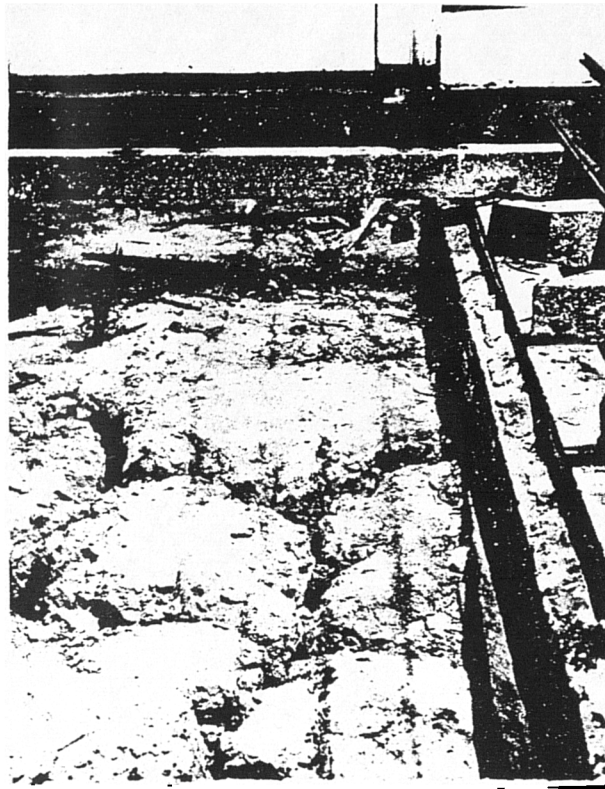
Crack pattern at surface beneath timber floor in Adelaide Steamship Building, Australia (Aitchison and Woodburn, 1969)
